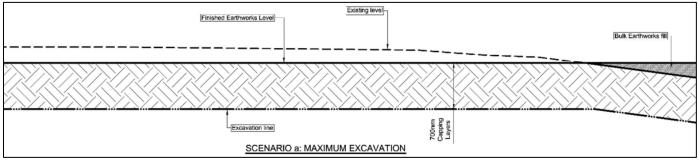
MAXIMUM EXCAVATION SCENARIO (SOURCE: WALTERS, 2020)
